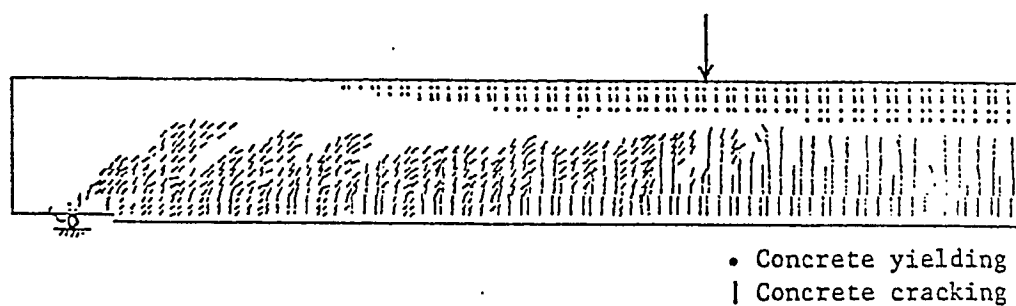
Zones of concrete microcracking and compression yielding for beam URB4 at a load of 59 kN.
